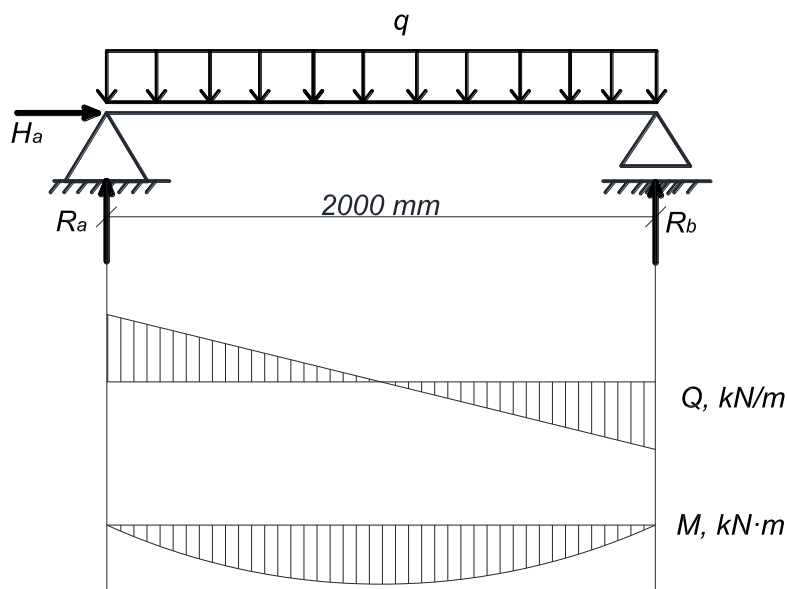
Structural model of the wall structure, shear force and moment diagram
